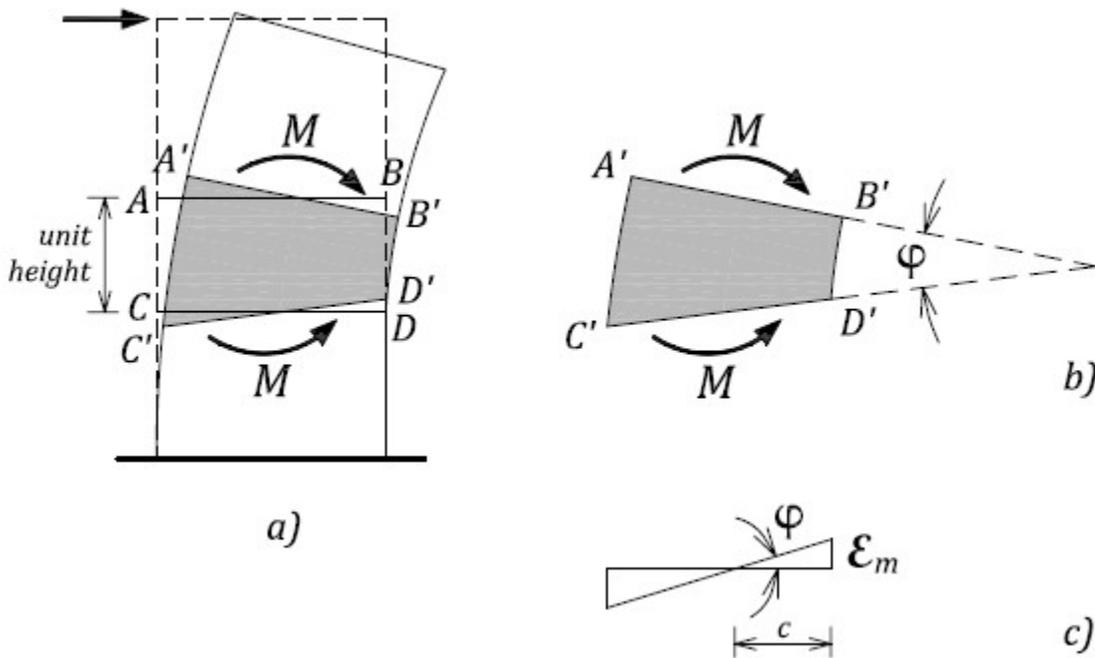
Curvature in a shear wall subjected to flexure: a) wall elevation; b) deformed wall segment ABCD; c) strain distribution along the section CD.
